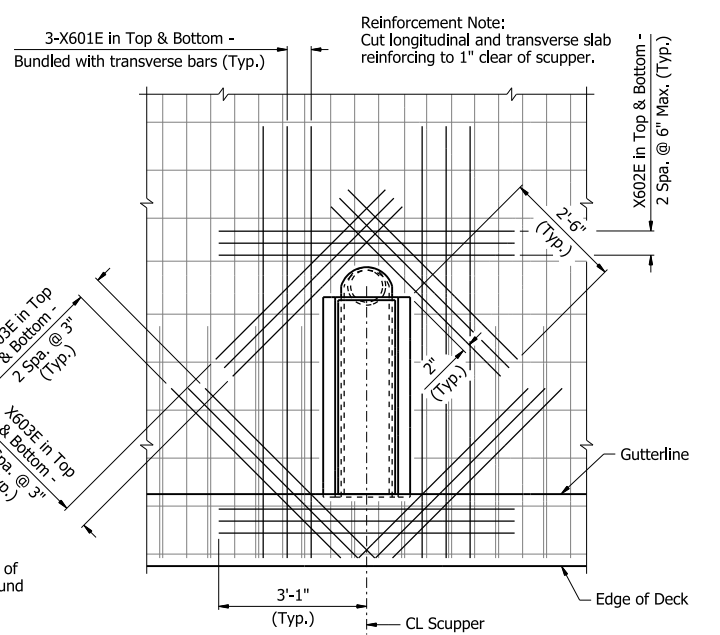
DETAILS AT BRIDGE NO. 07684 (BENT NO. 8)
